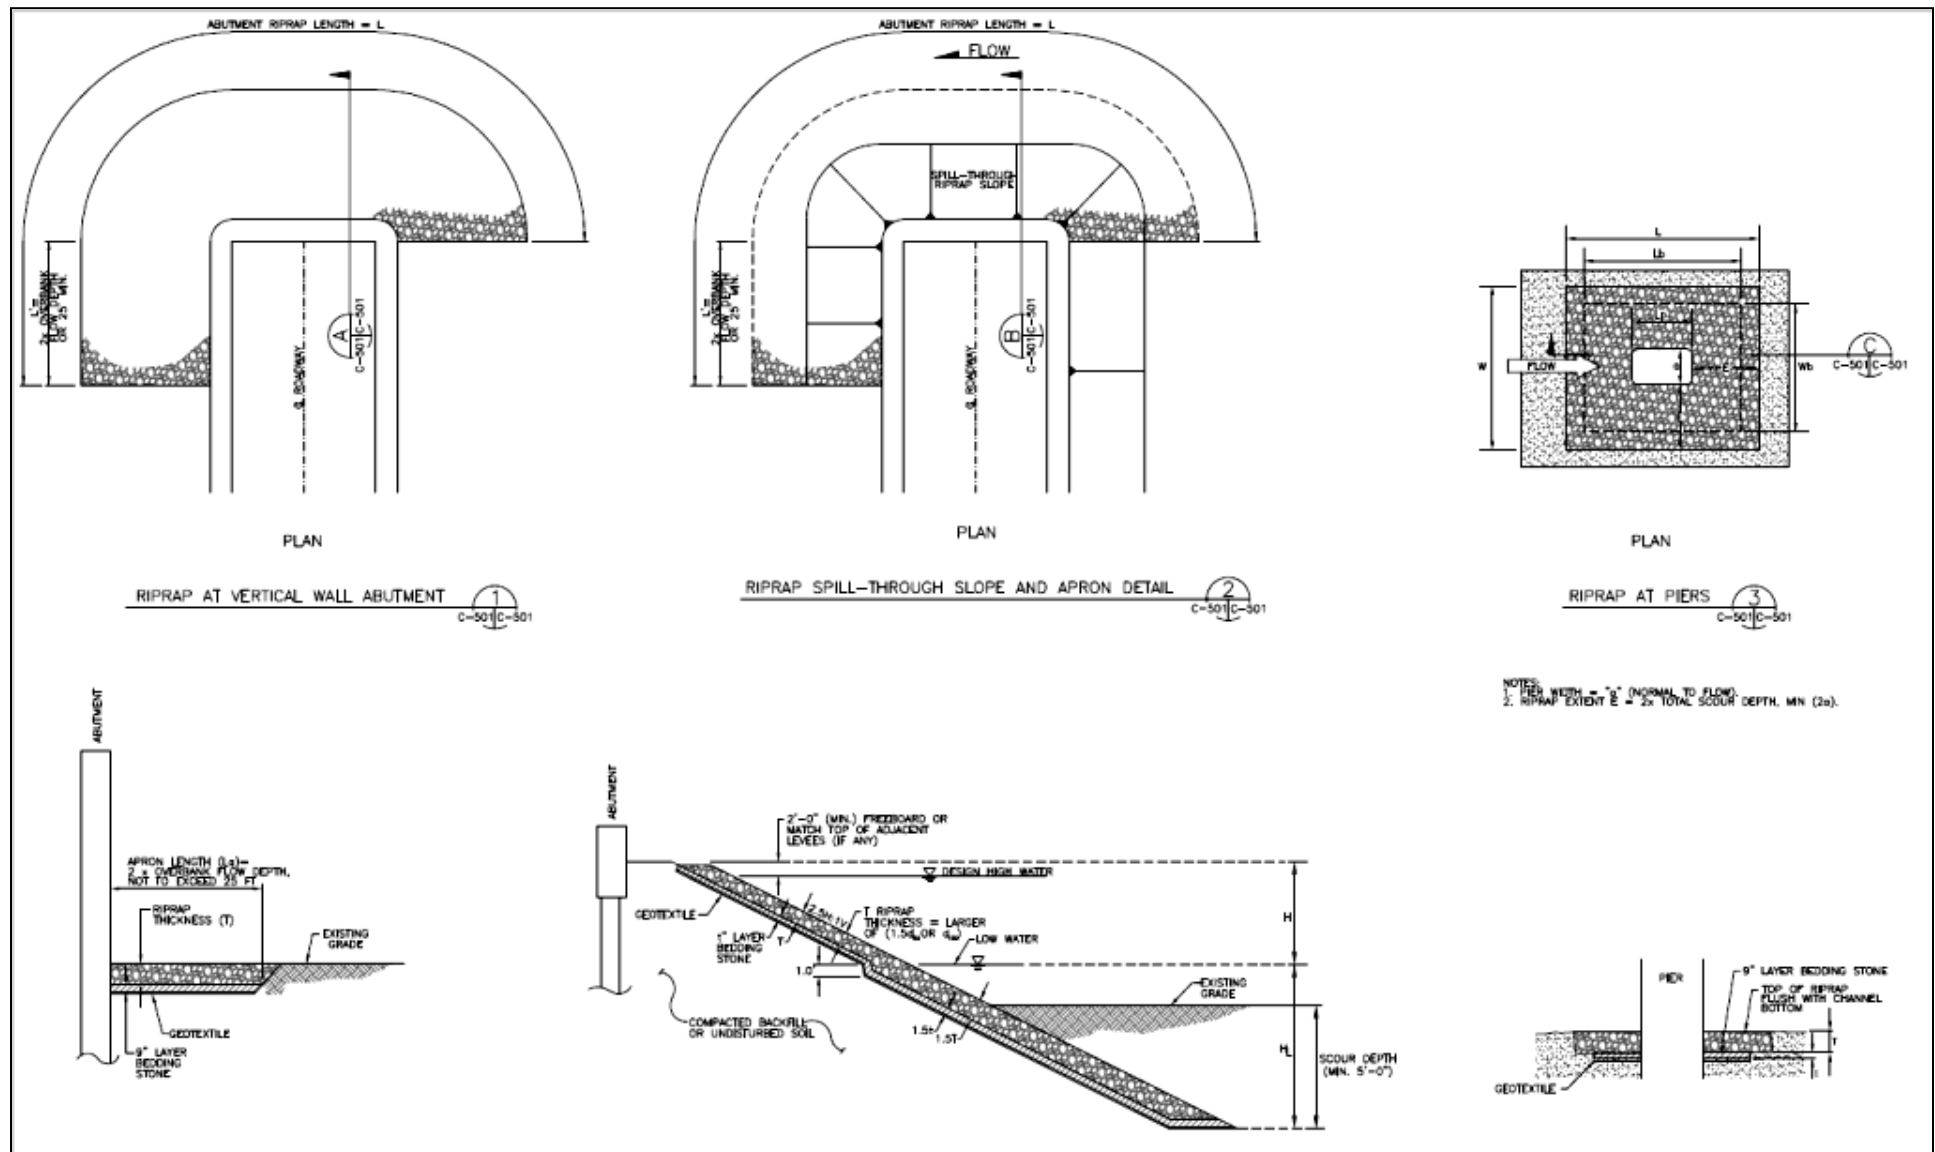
Typical Bridge Pier and Abutment Scour Protection Measures.
